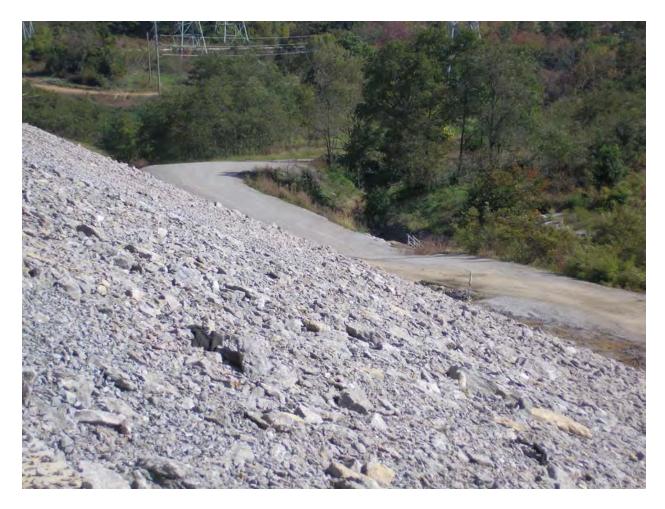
Main Pond: Downstream Slope at South End of Southeaster Section
